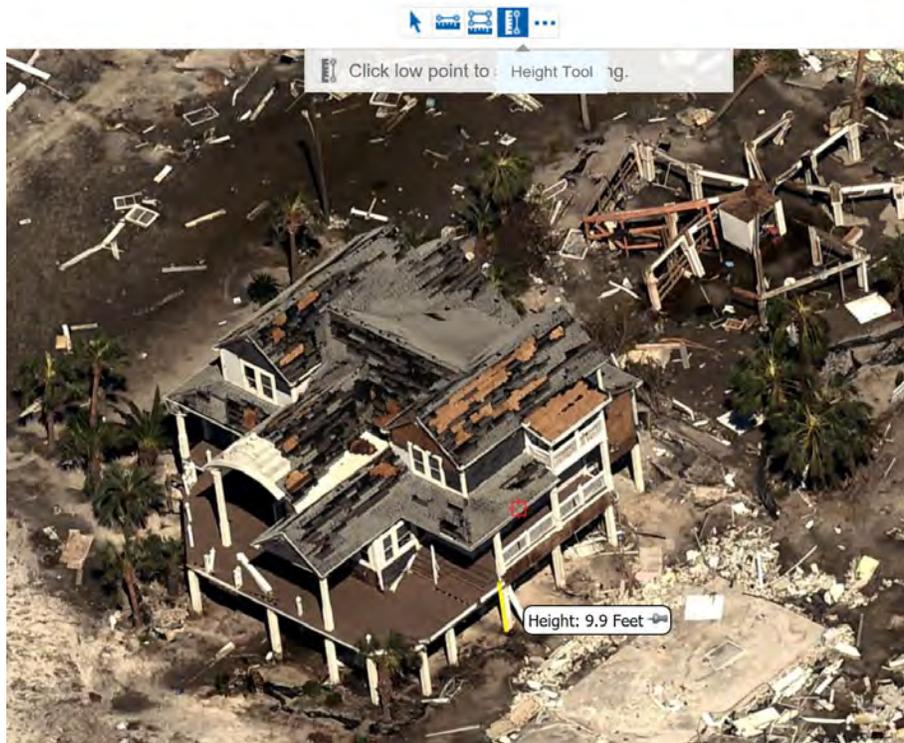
Measuring first floor elevation in Pictometry Eagleview.
